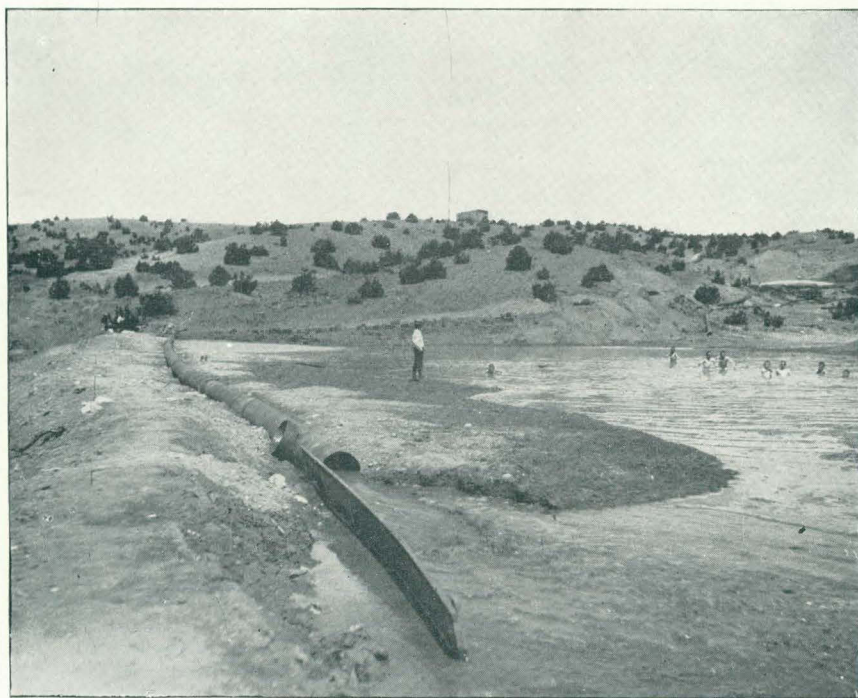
Dam site on Santa Fe Creek, New Mexico.
